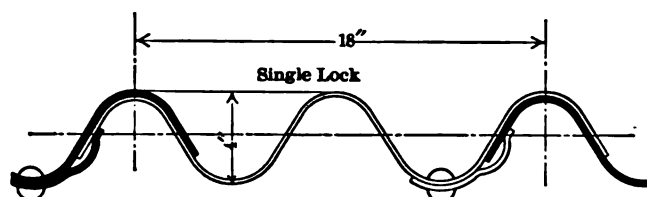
WEMPLINGER'S STEEL SHEET-PILING.
